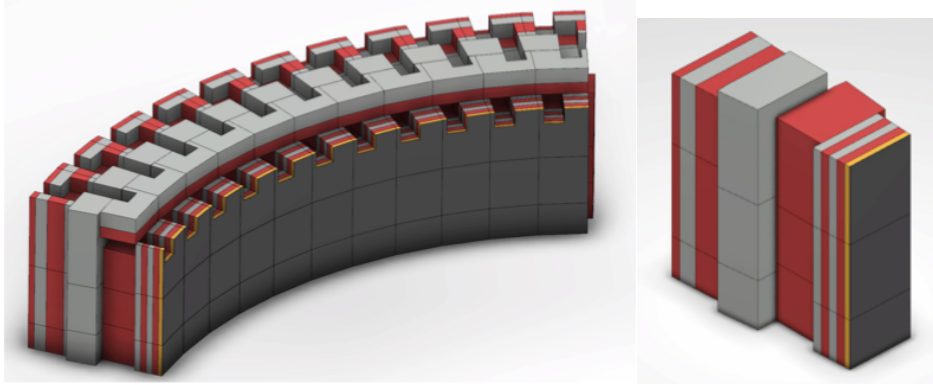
Schematic illustration of the bunker wall and an individual block used to build up the bunker wall.
